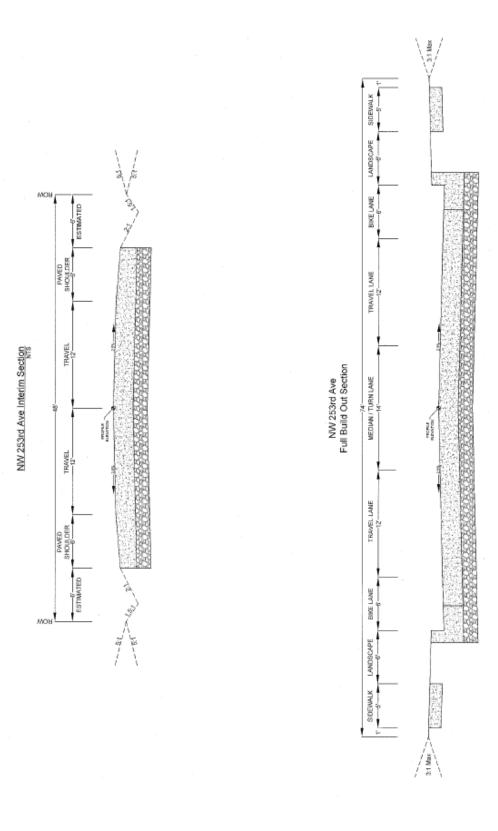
NW 253<sup>rd</sup> Avenue Typical Sections
